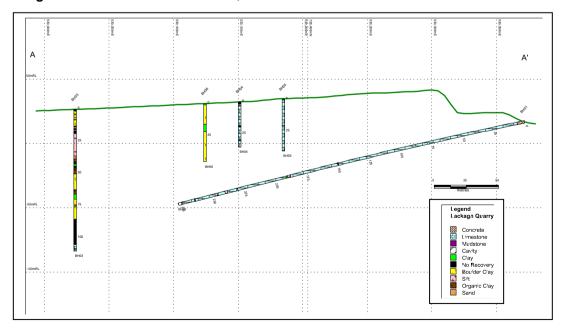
A - A' Drill Section (looking North) through the Lackagh Quarry GI Site
